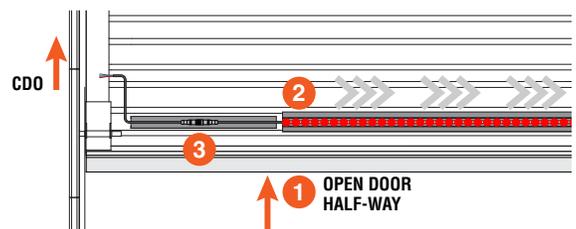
A: Sectional Door LED Strip & Cable Raceway Installation
